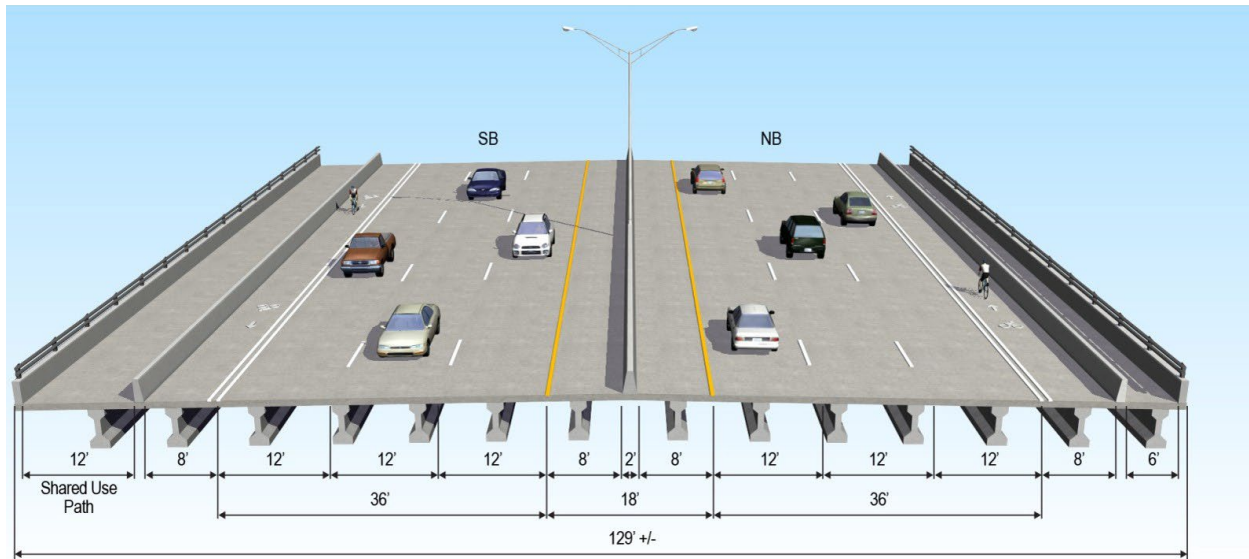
| Proposed Bridge Typical Section - US 41 Over Alafia River
